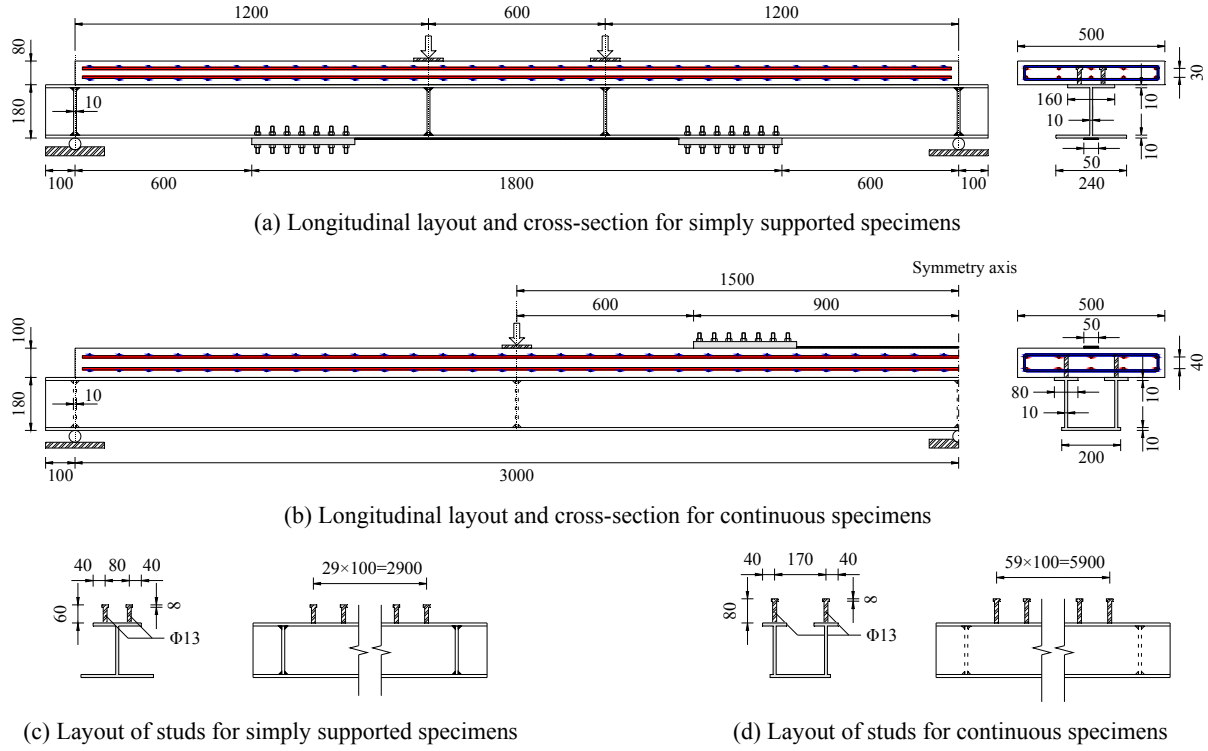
Specimen geometry and test set-up (all dimensions in mm)
